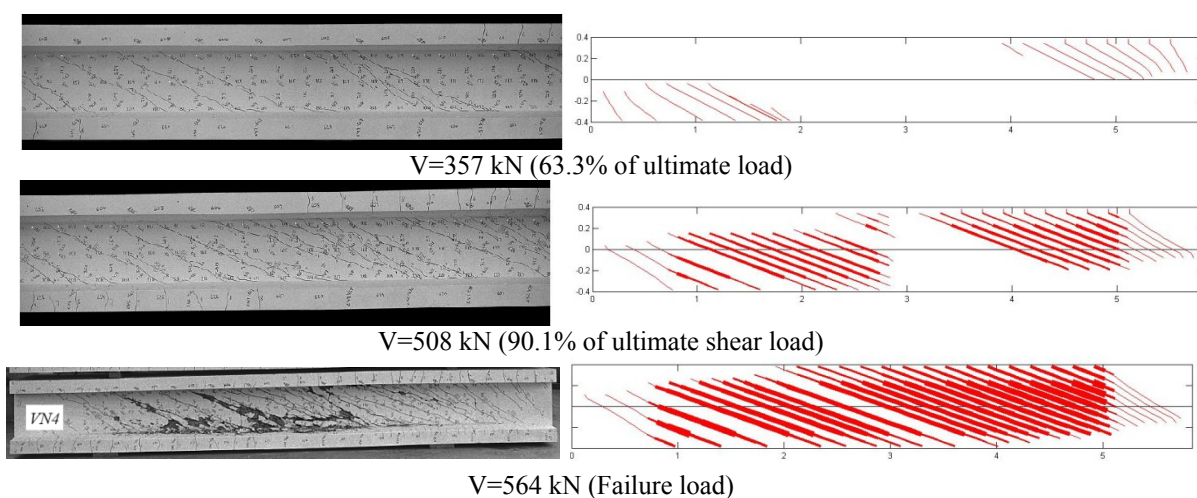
Cracking patterns at different load levels for beam VN4
